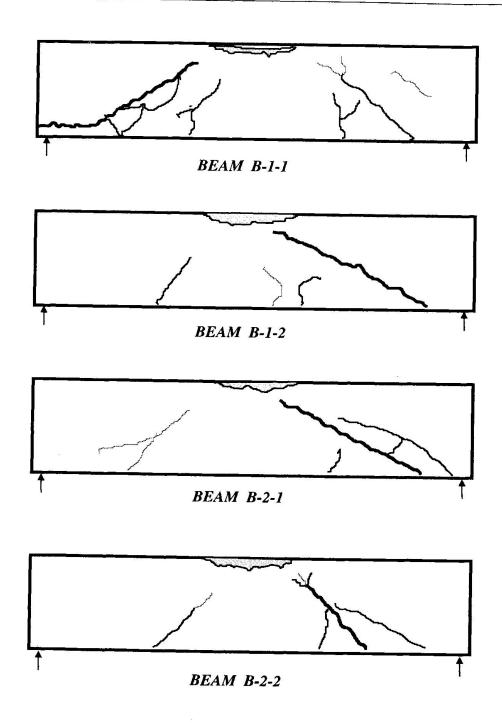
Cracks and Failure Pattern of Beams Under Flexure
